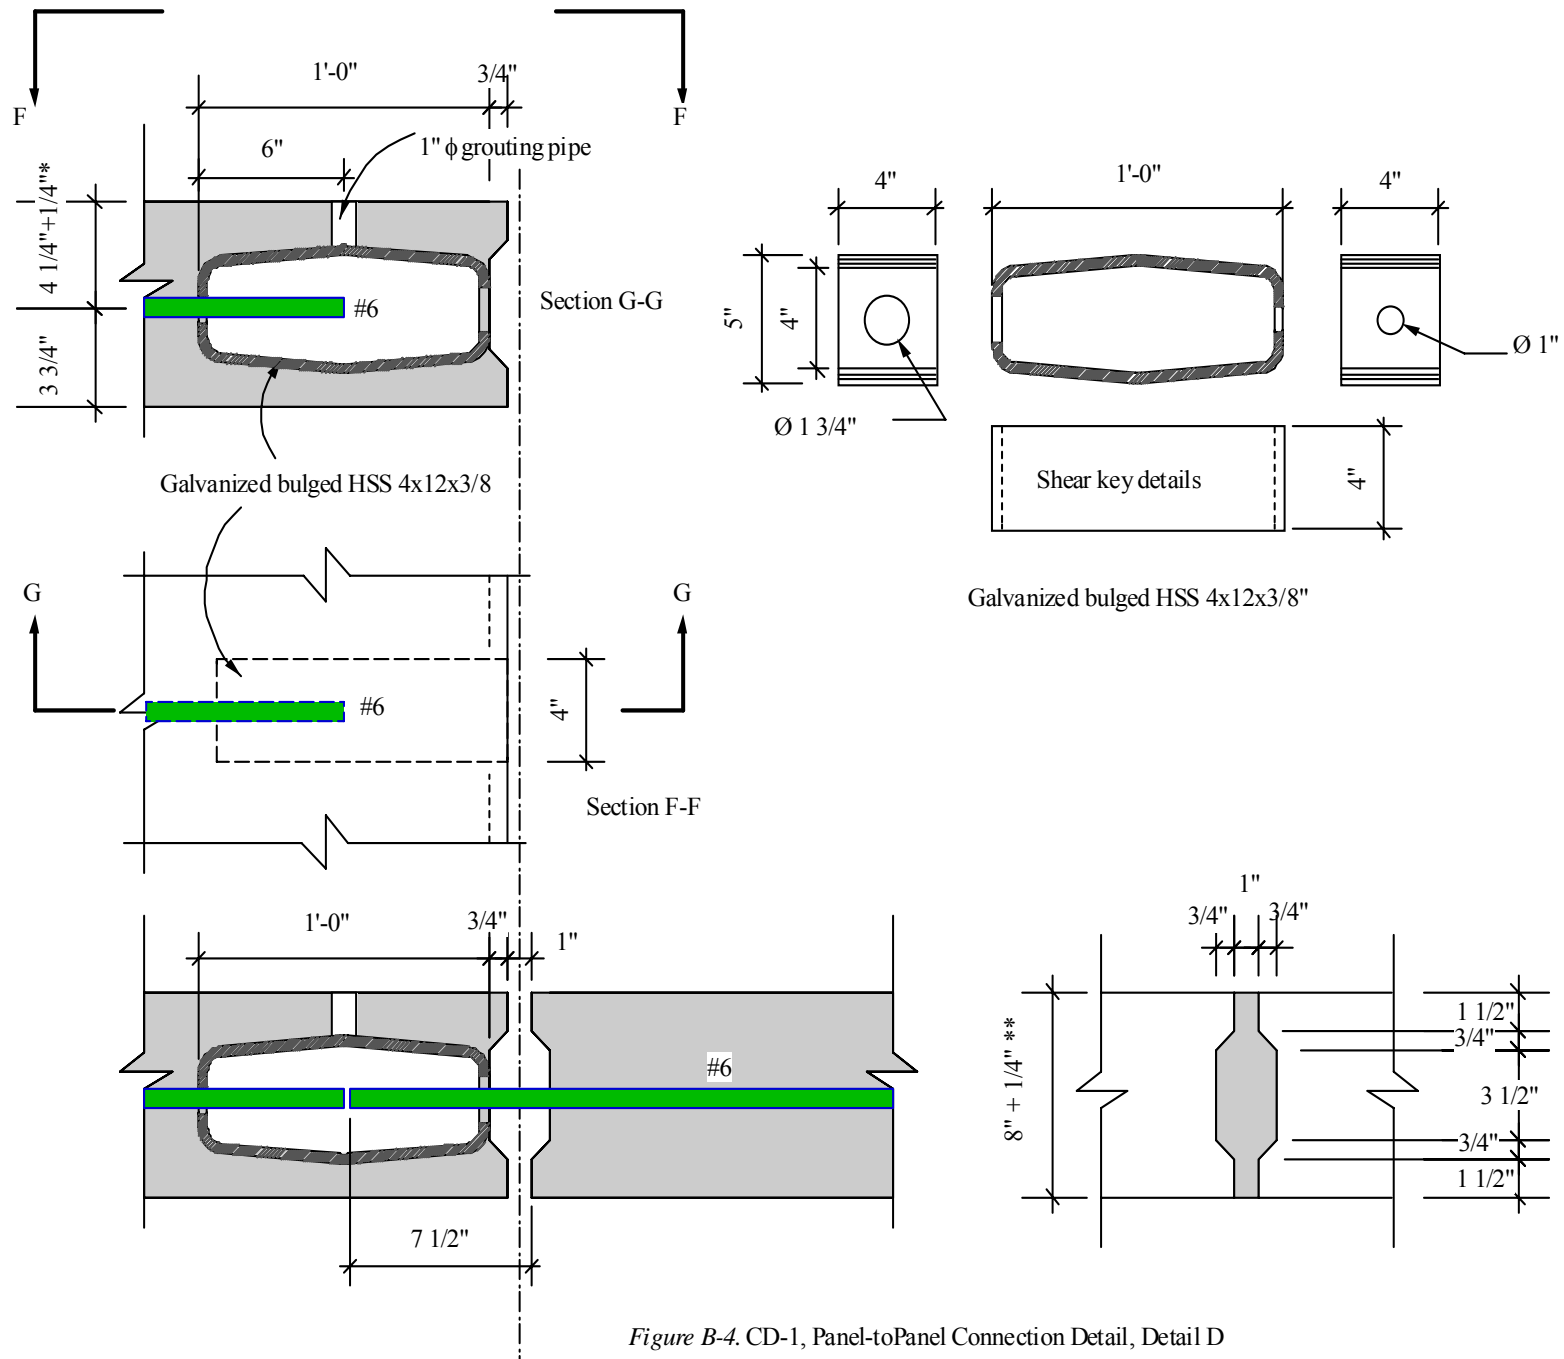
CD-1, Panel-to-Panel Connection Detail, Detail D
